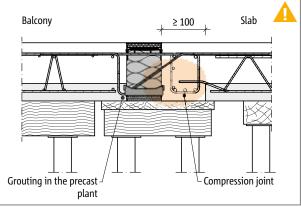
Schöck Isokorb® XT type K: Direct support, installation in conjunction with element slabs (here: $h \le 180$ mm), compression joint on floor side
